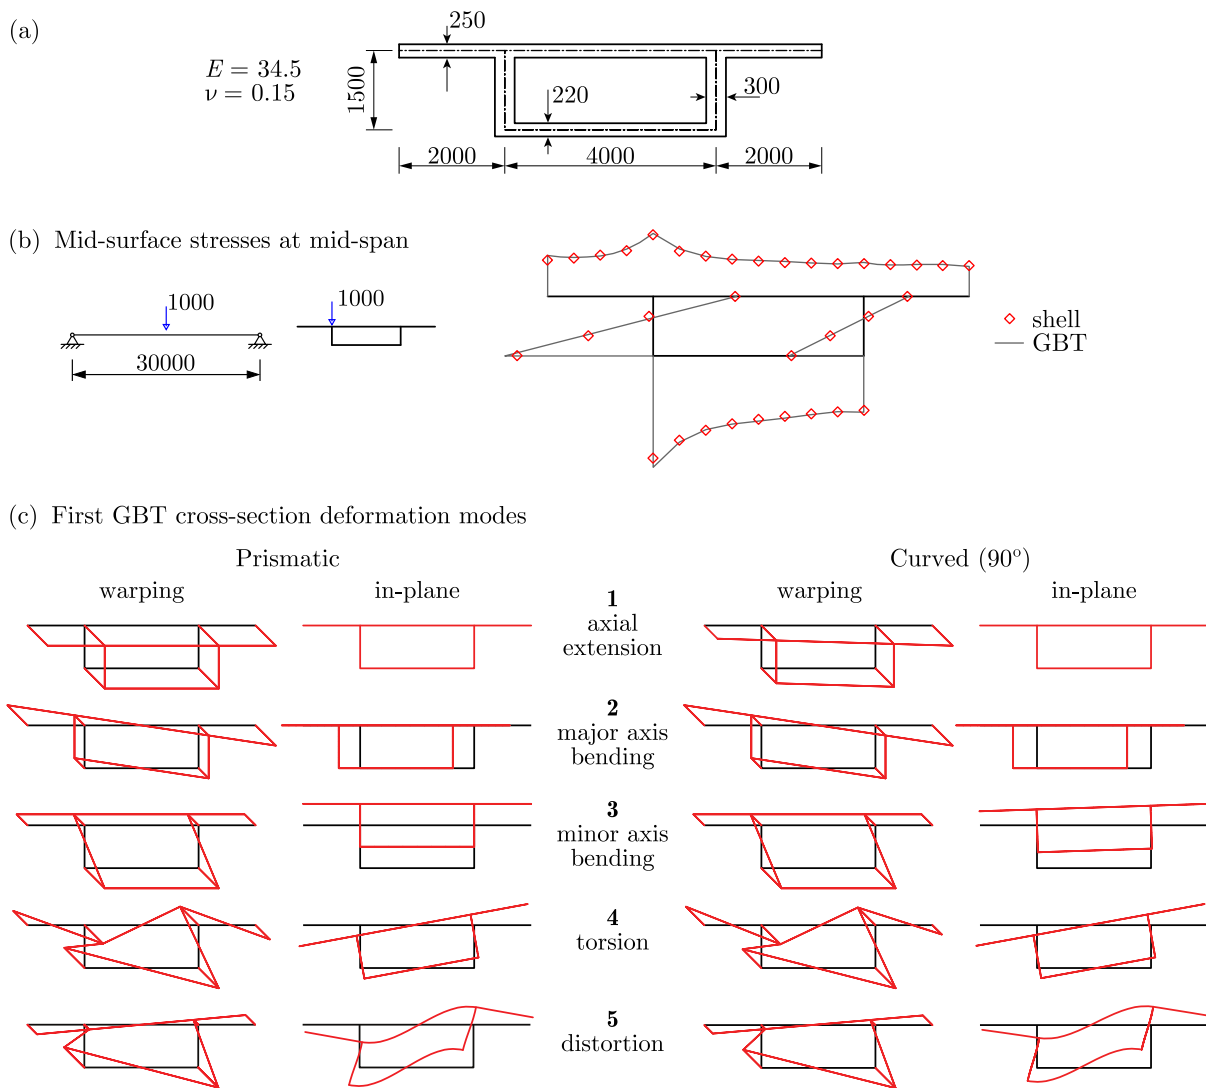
Concrete box girder bridge (a) cross-section geometry and material parameters, (b) mid-span stresses [18] and (c) first GBT deformation modes for the prismatic and 90° cases.
